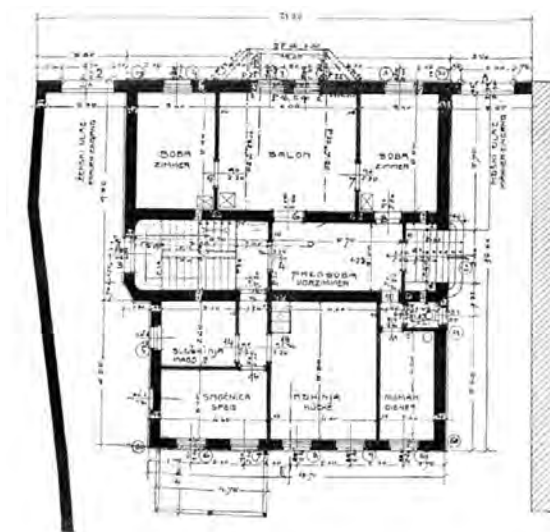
Villa Hušedžinović; ground floor plan [9:193]
